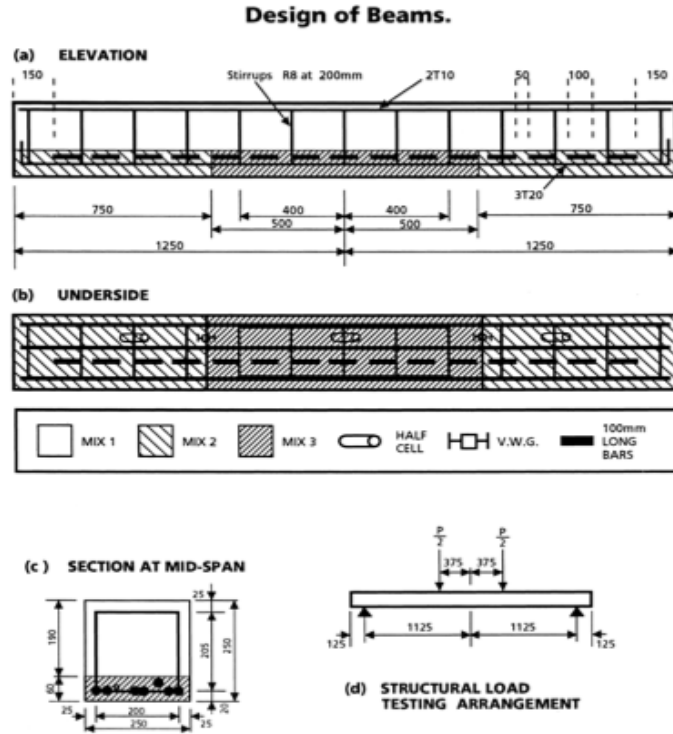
2- Design of beams (Nounu and Chaudha 1999).
